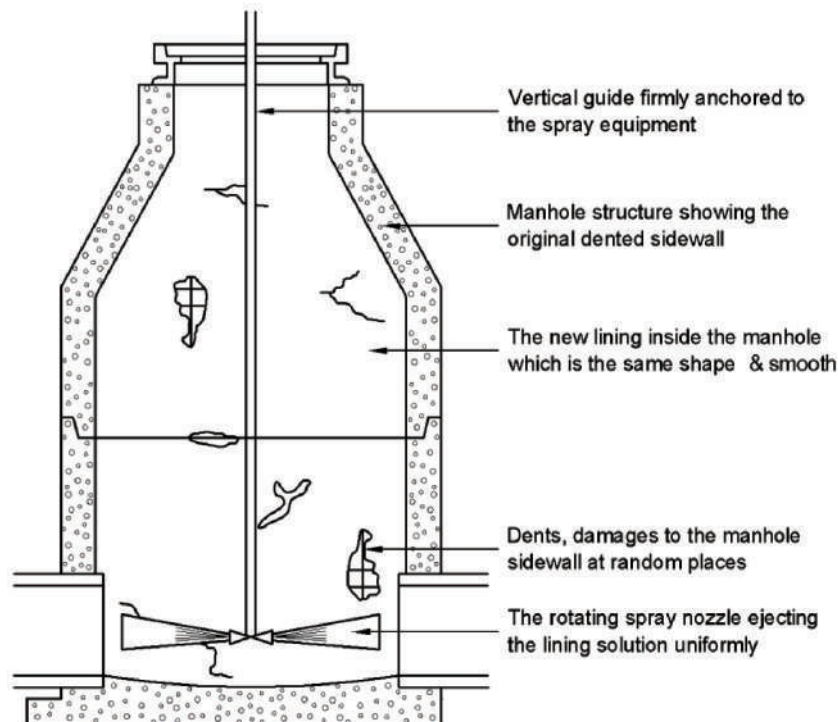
Depiction on in-situ sewer manhole lining (Spray equipment not shown)
